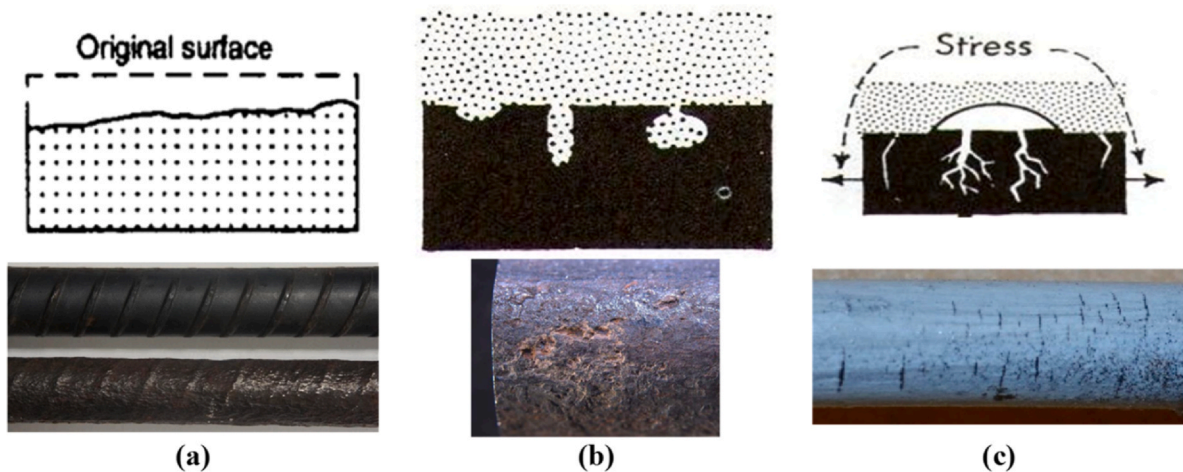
Corrosion mechanism in steel rockbolts: (a) uniform corrosion; (b) pitting corrosion; and (c) stress concentration cracking. Notes: sub-figures from top-to-bottom are schematic representation of corrosion (after Aziz et al. [31]) and corrosion examples (after Aziz et al. [37] and Wu et al. [35]).
